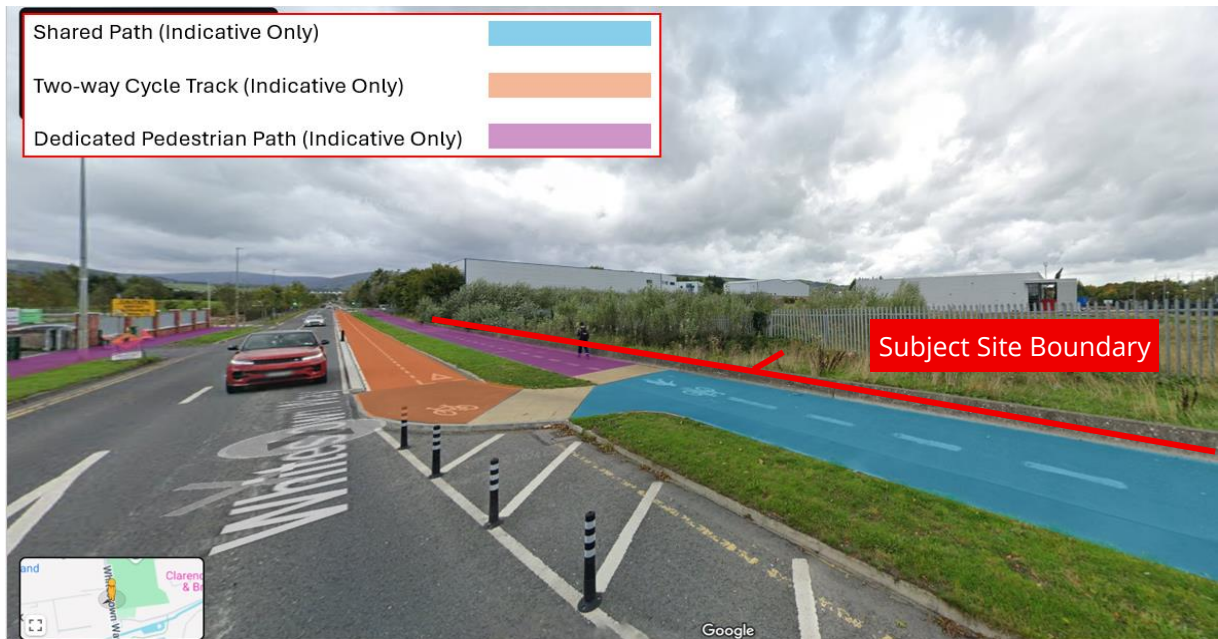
Cycling Facilities along Whitestown Way Facing South)
